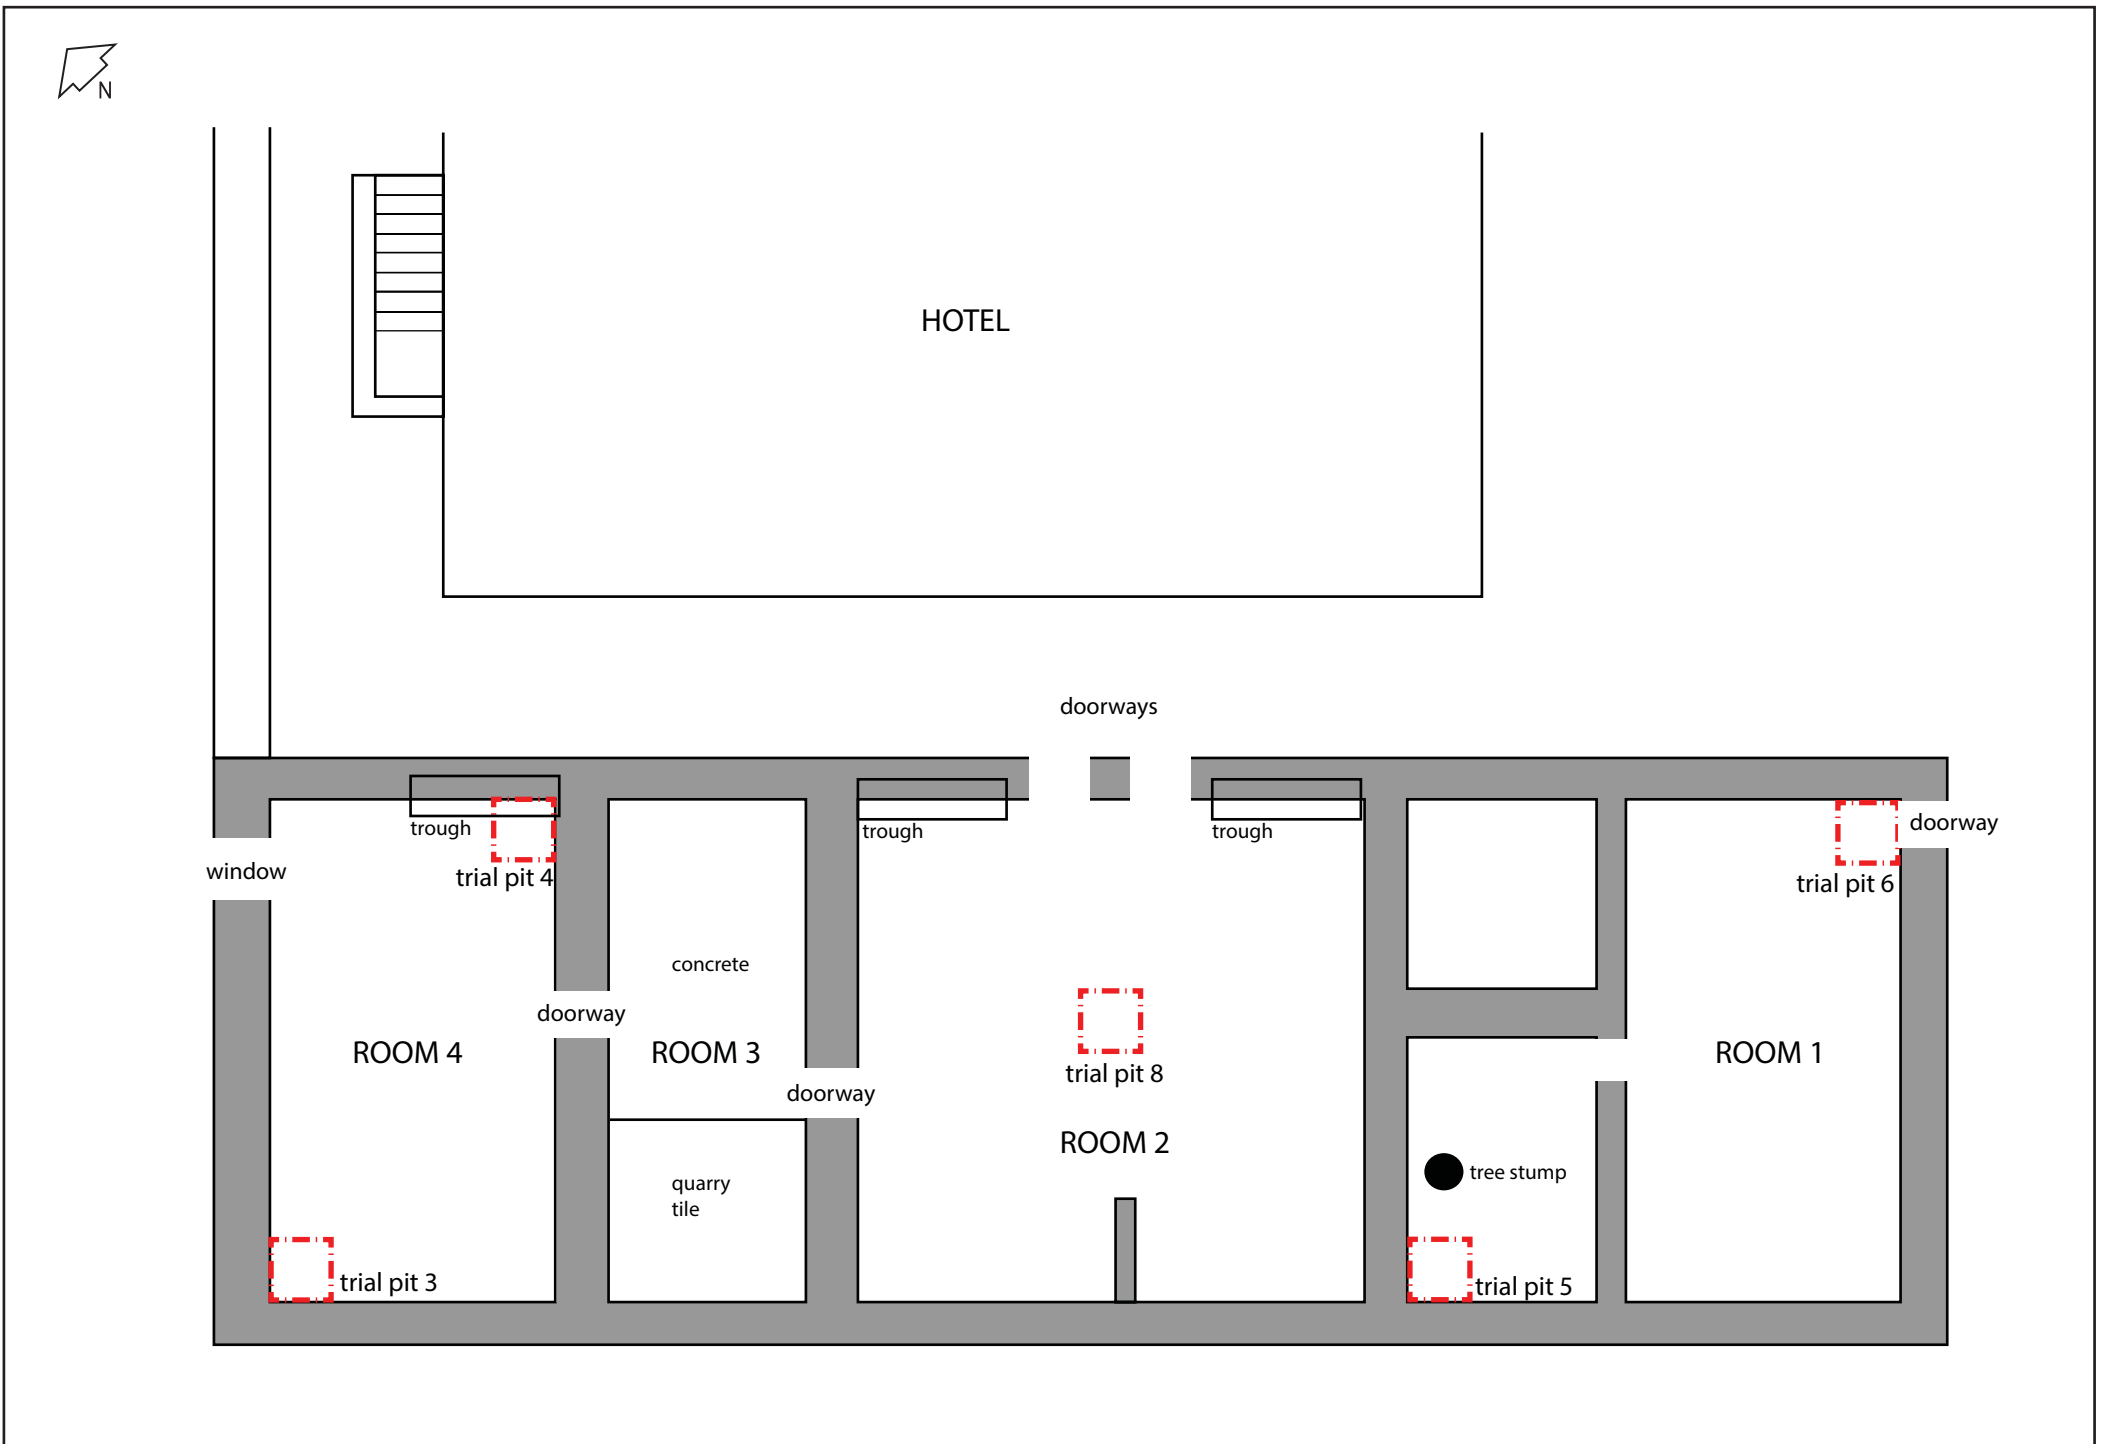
Plan of Pigsty and location of trial pits. Based on Reclesia Drawing No. 050. Not to scale.
